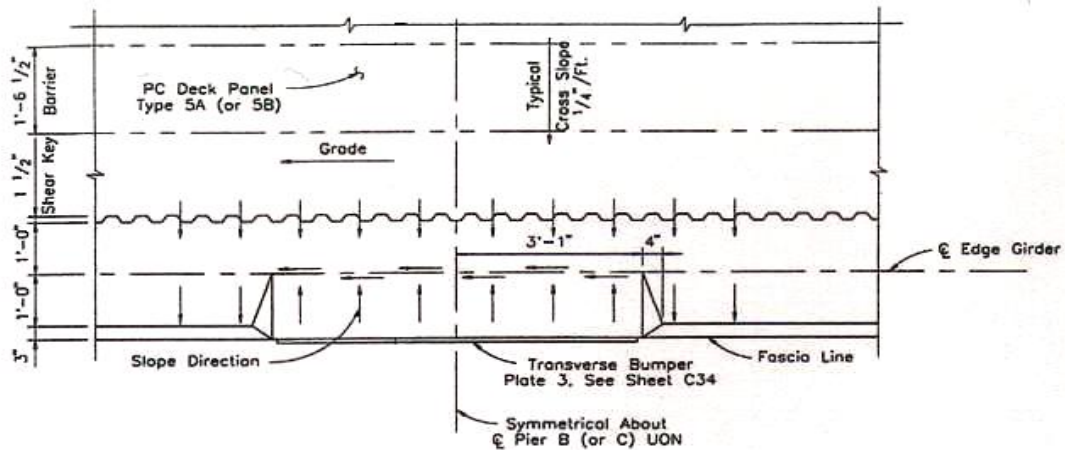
Plan view showing detail of the shear key system
